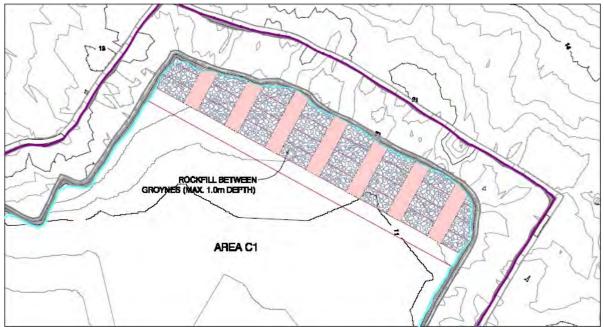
Typical initial capping layer placement, post geotextile, finger or groyne method, infill (plan view)
